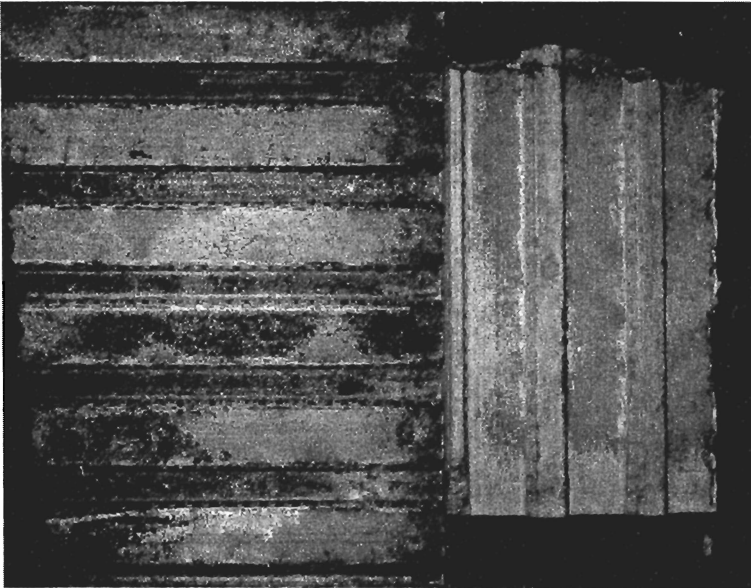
Photograph Showing Surface Condition of Galvalume Composite Slab (Top--Steel Deck; Bottom--Concrete)
